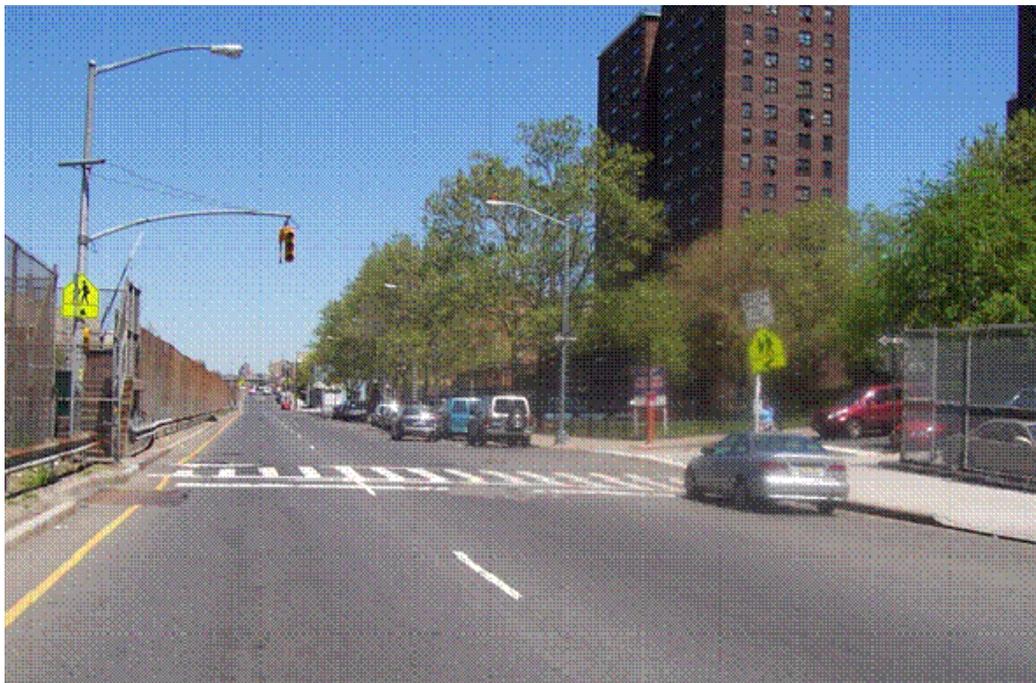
Looking north along Park Avenue across west end of St. Paul's Place, guide rail and fencing block approaching driver's view of pedestrian bridge landing area
